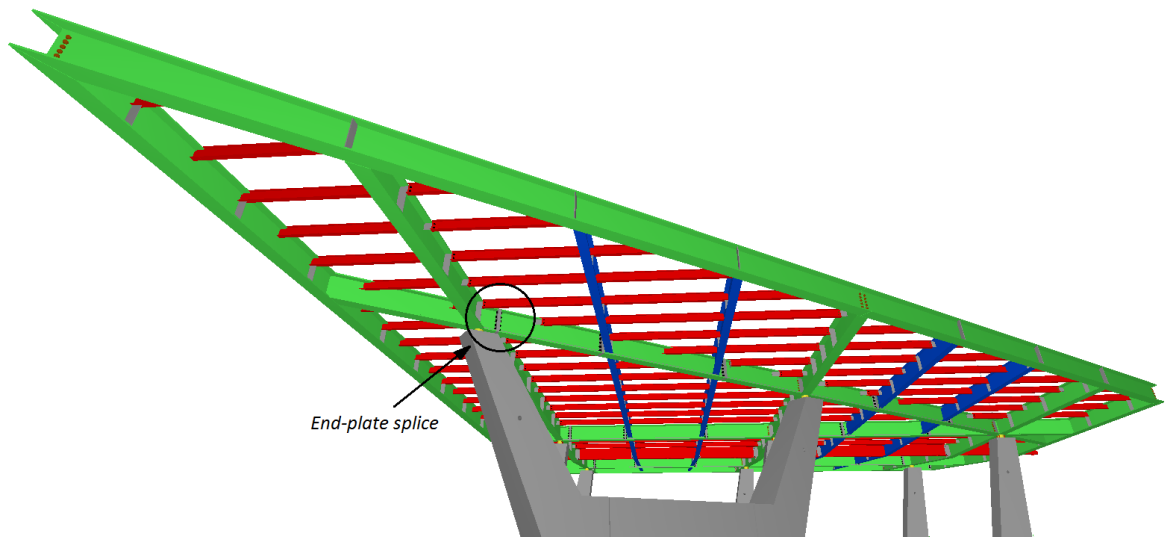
An example of a roofing structure, in which the structural members have been spliced by using end-plate splices. In this example, the horizontal beams have been spliced to enable transportation from the workshop to the construction site. (Roofing structure in Länsiterminaali, Helsinki 2017)
